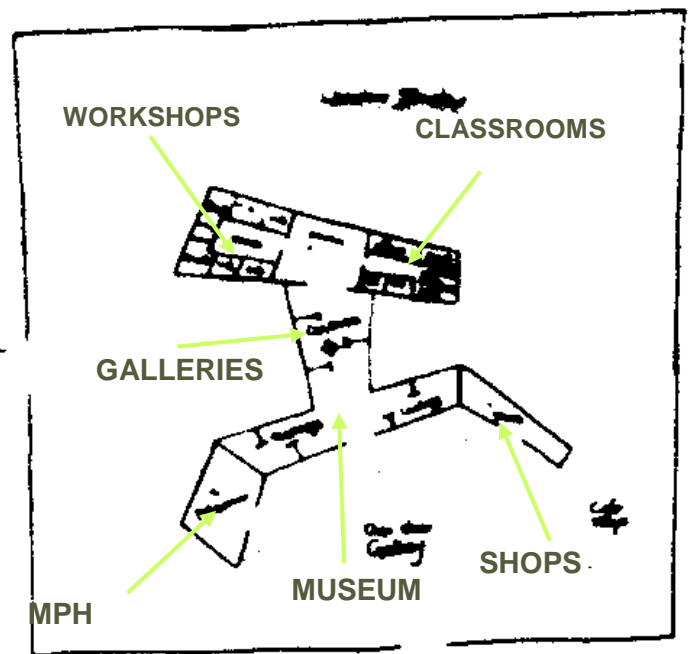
GROUND FLOOR PLAN (PRIMARY STAGE)
